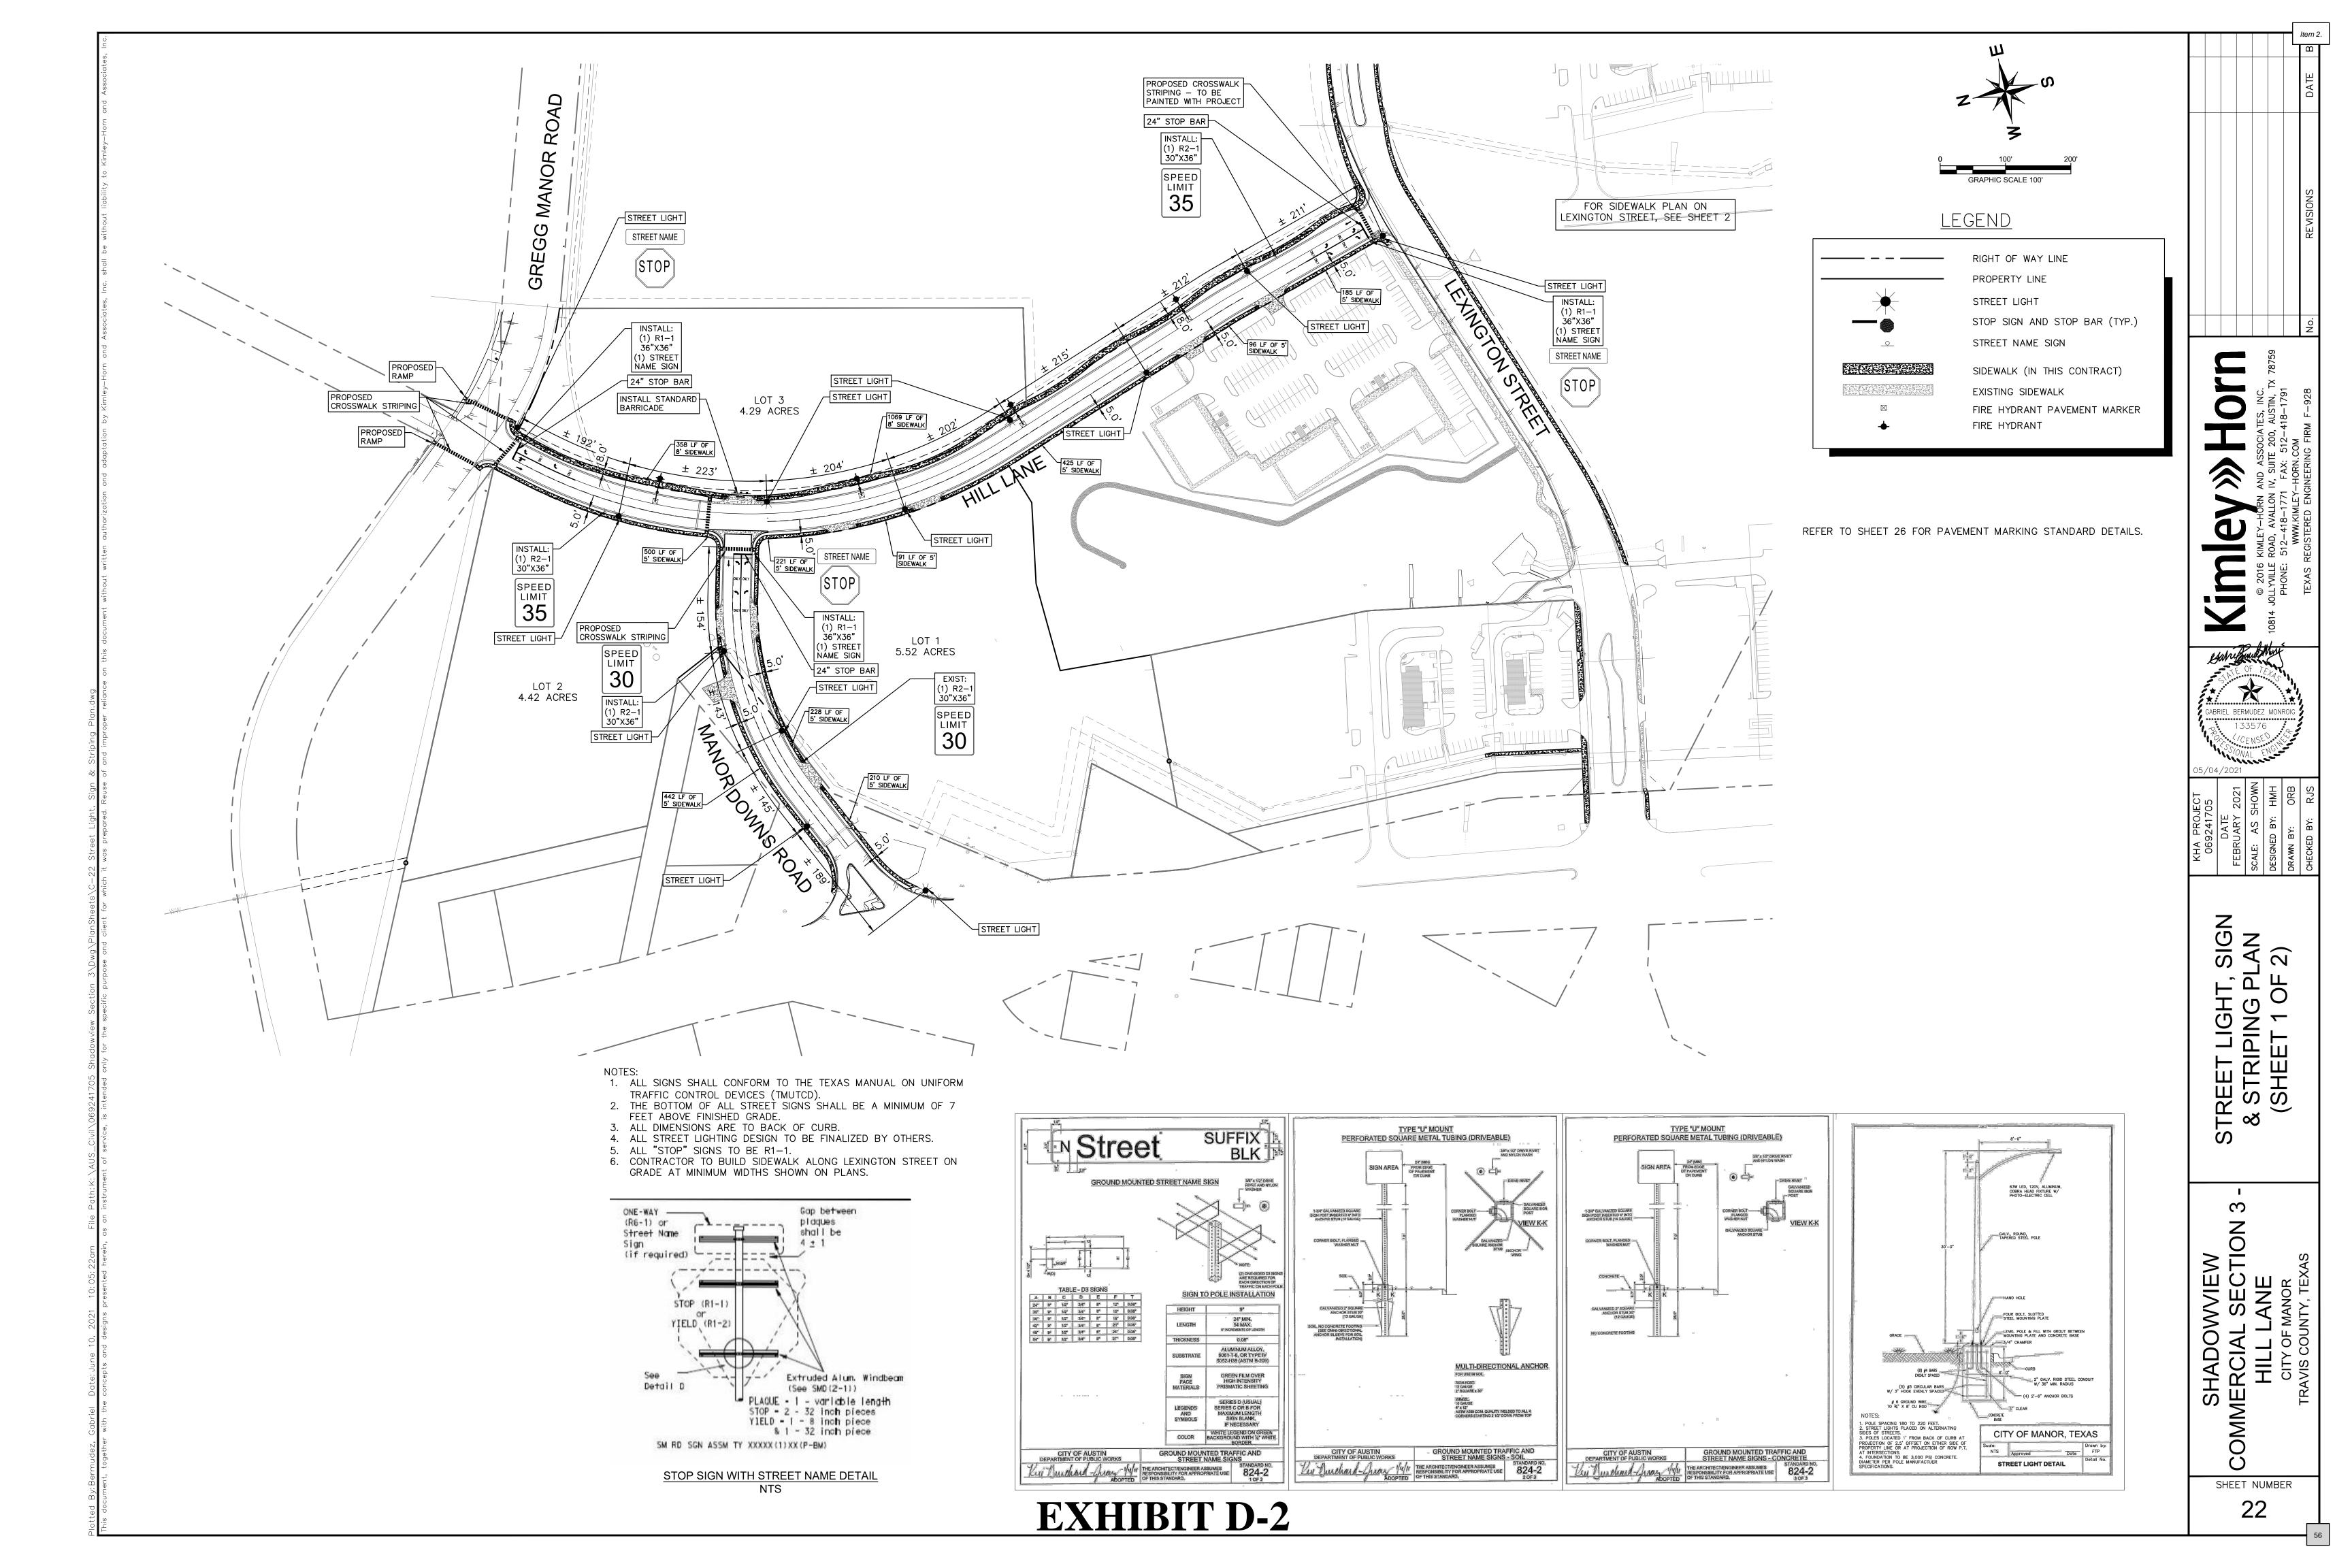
<u>Hill Lane – Street Light, Sign and Striping Plan</u>
